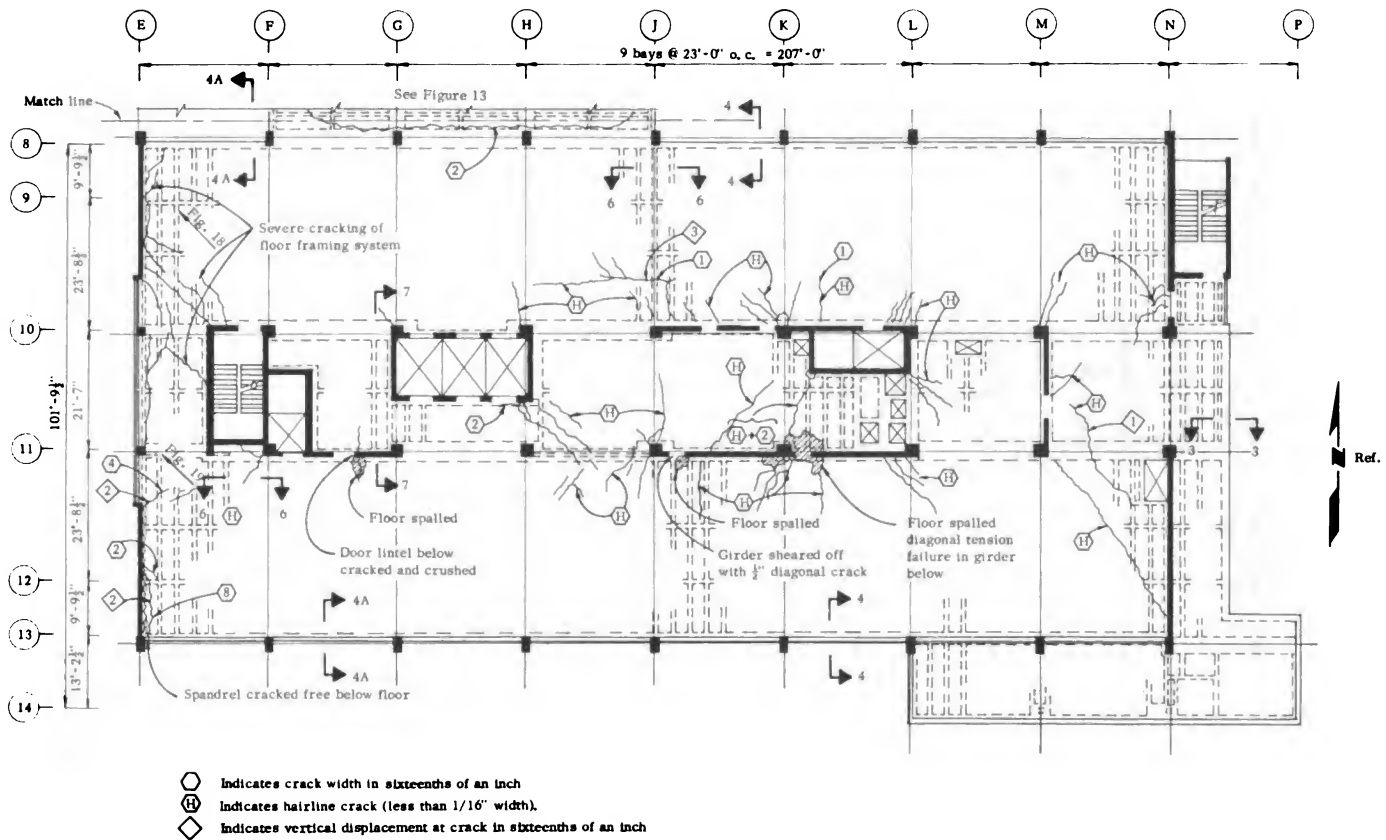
Holy Cross Hospital. Third-floor framing plan (7-story tower).
